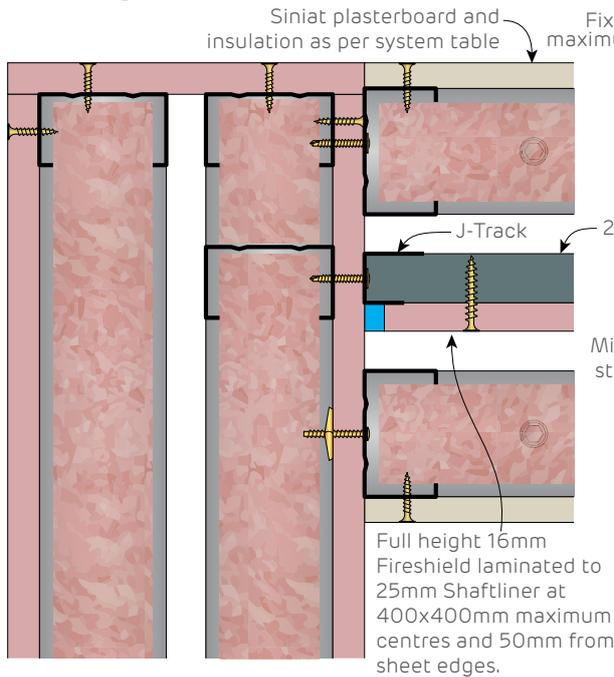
Interhome Highrise Wall Connection to Fire Rated Plasterboard Wall
